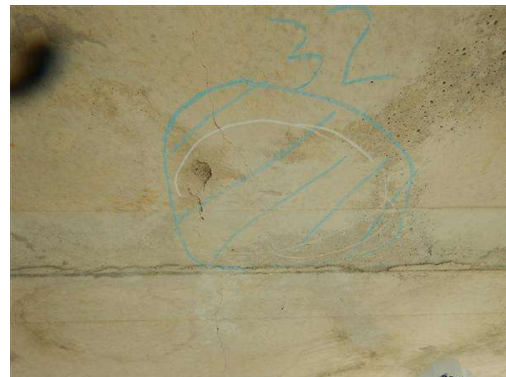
Delaminated concrete patch in the bottom flange/slab of Span 28SB looking North
